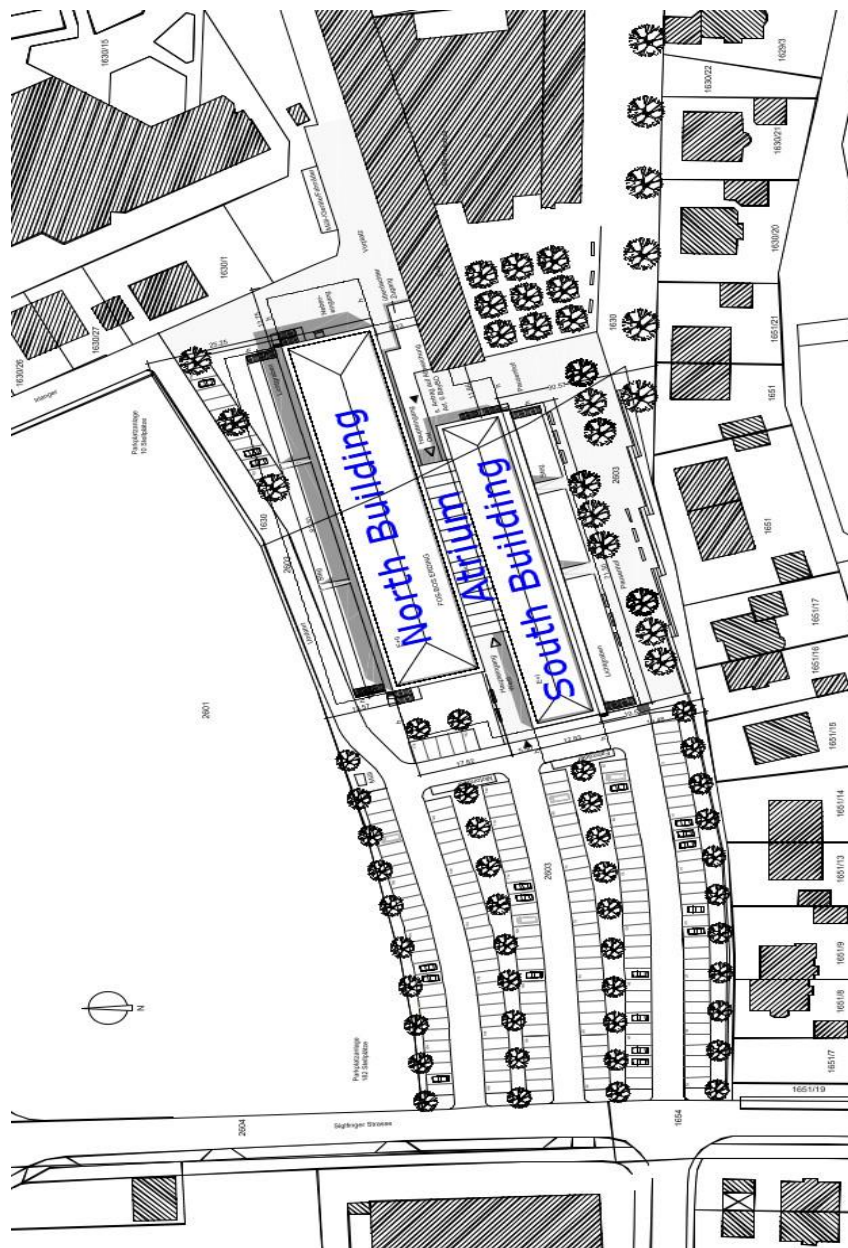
Location plan of the FOS/BOS Erding (excerpt from ([kplan 2011](#))).
